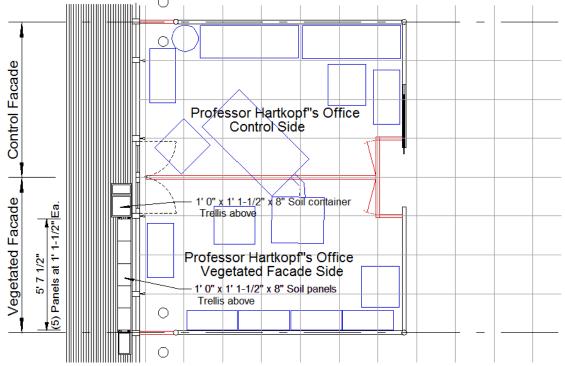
West Façade Research Bay Floor Plan, Leininger, 2012
